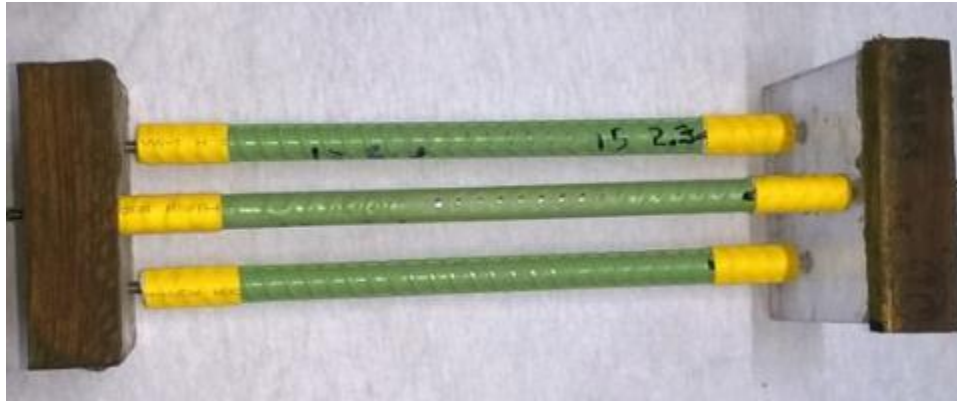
Photographs of typical rebars used to prepare 3-bar prism specimens and lollipop specimens
